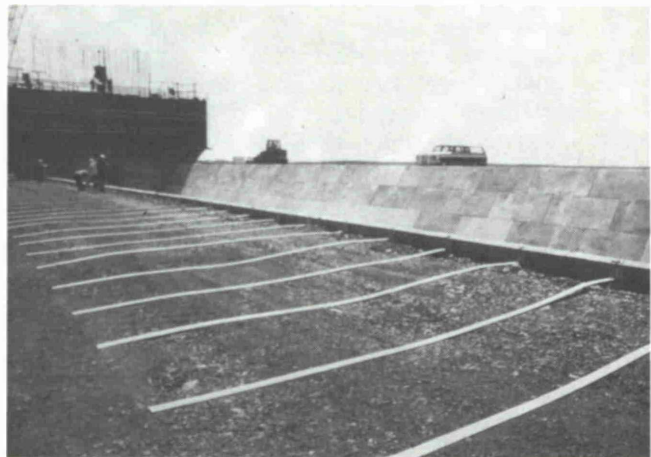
Galvanized steel reinforcing strips are bolted in place to the REINFORCED EARTH inclined sidewalls
